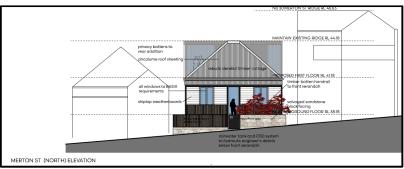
Streetscape elevation of subject site, showing the modest nature of the built form in the streetscape whilst also noting that the garage/undercroft area are not perceptible from the streetscape of Merton Street.
